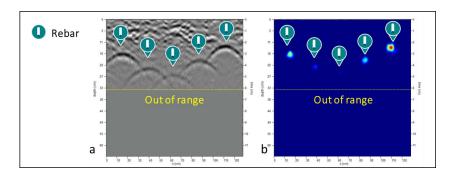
Hilti PS-1000 detects all rebars; however, the back wall is out of range
